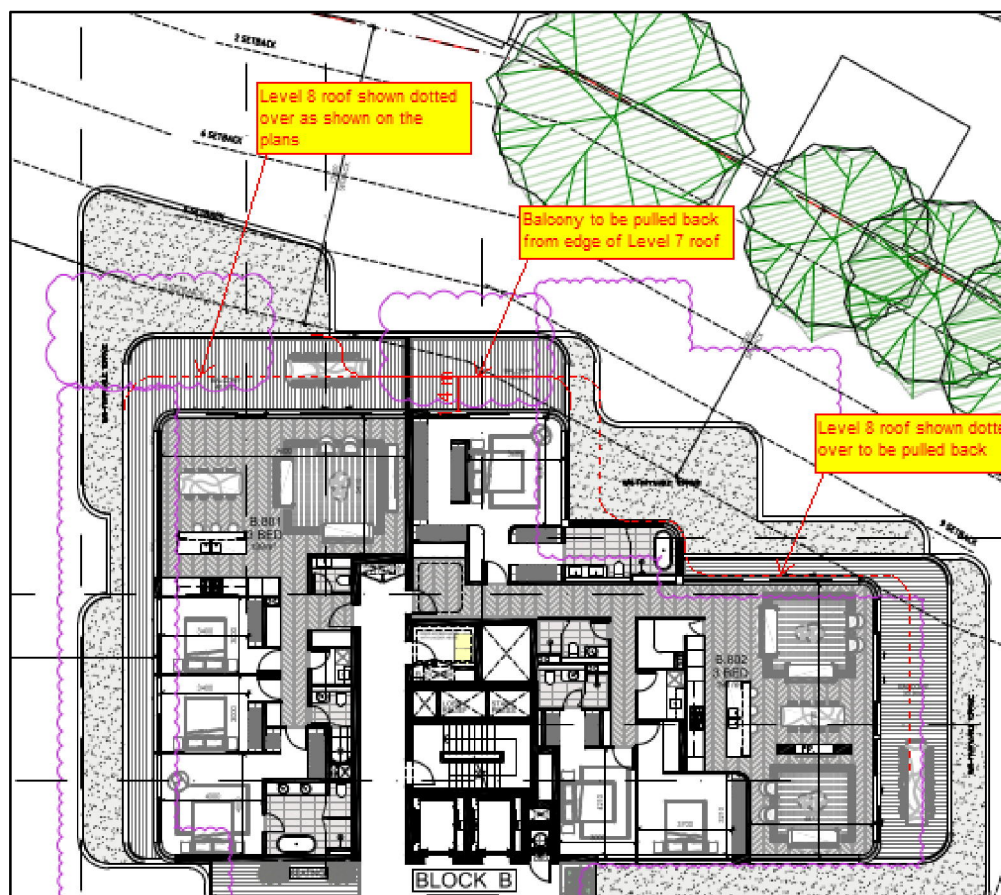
Approved balcony depths / roof Apartments B8.01 and B8.02
